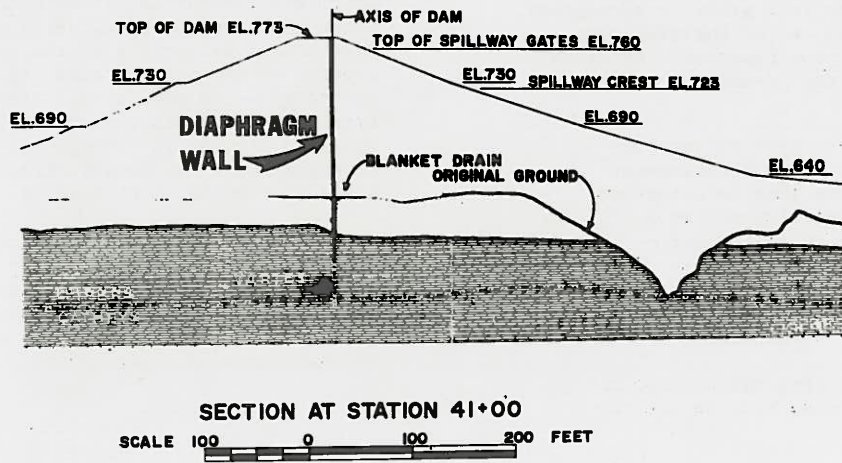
SECTION OF EMBANKMENT SHOWING CONCRETE DIAPHRAGM WALL.
